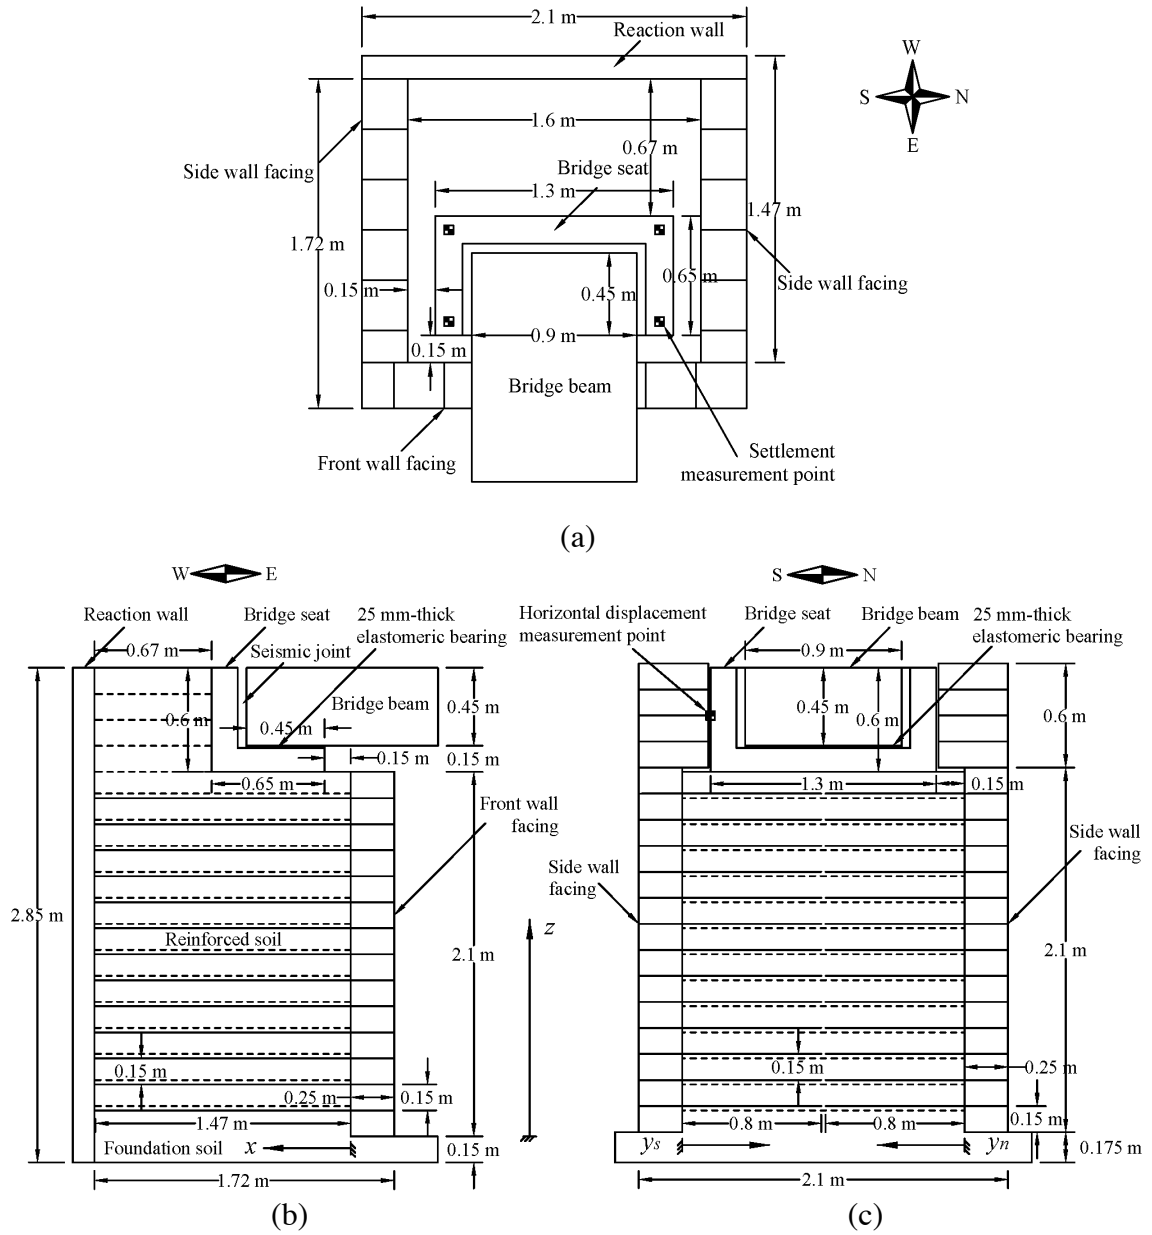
GRS bridge abutment model for transverse test: (a) top view; (b) longitudinal cross-sectional view; (c) transverse cross-sectional view. Note: dashed lines indicate reinforcement layers perpendicular to diagram.
